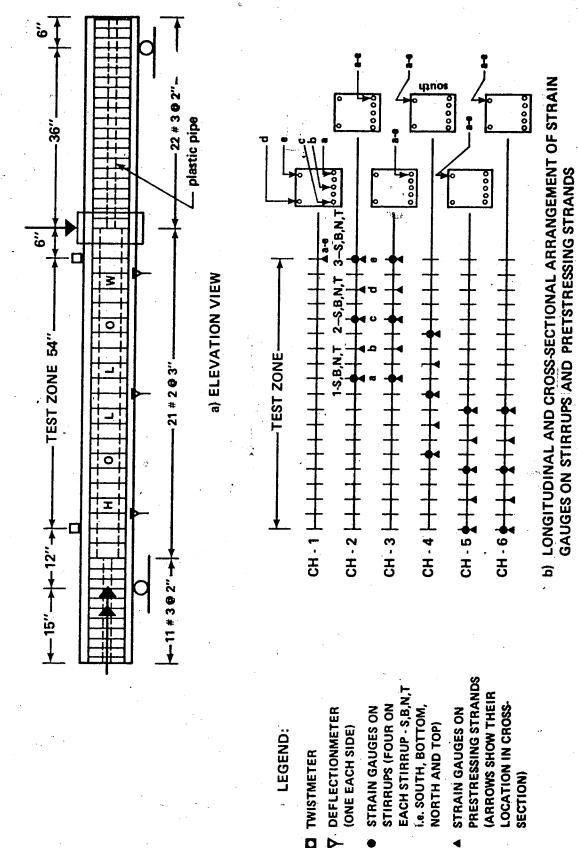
ELEVATION VIEW AND INSTRUMENTATION OF CH GROUP BEAMS
